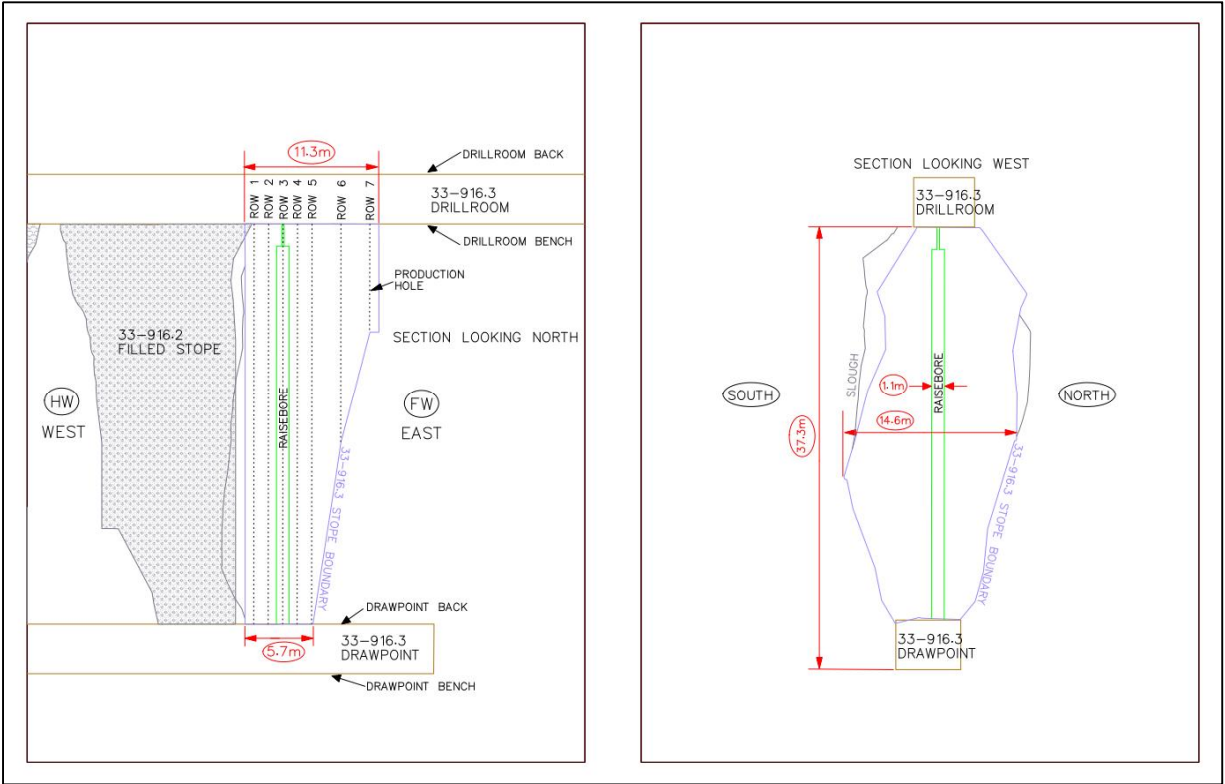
Longsection and cross-section of the 33-916.3 Stope
